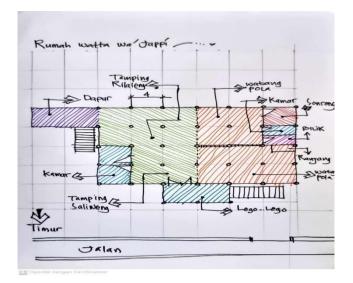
Sketch of Uwwata' Wa' Jappi House Plan
